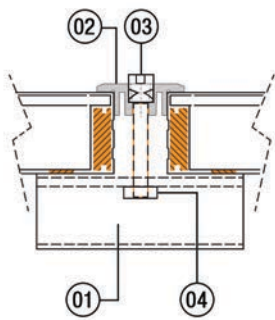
cross section of a mounting clamp to be used for attaching the modules to support structure (minimum length is 40 mm).
